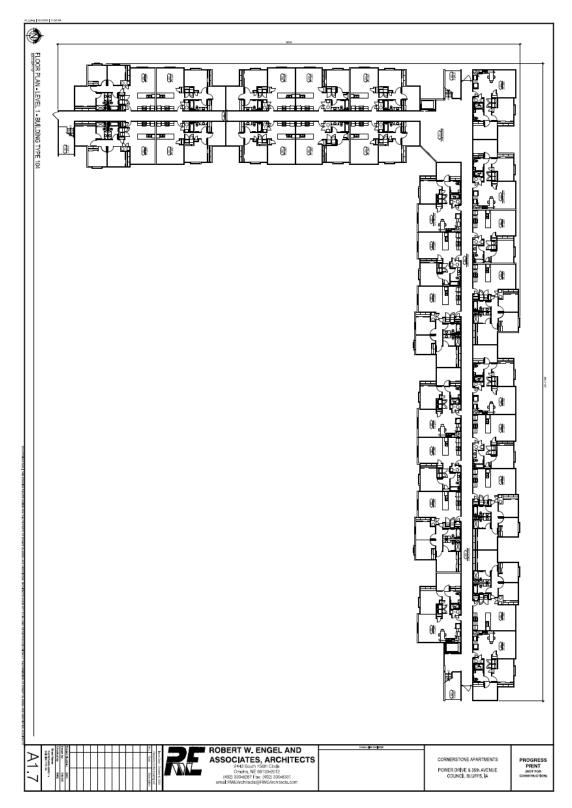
PROPOSED FLOOR PLANS (cont.)
